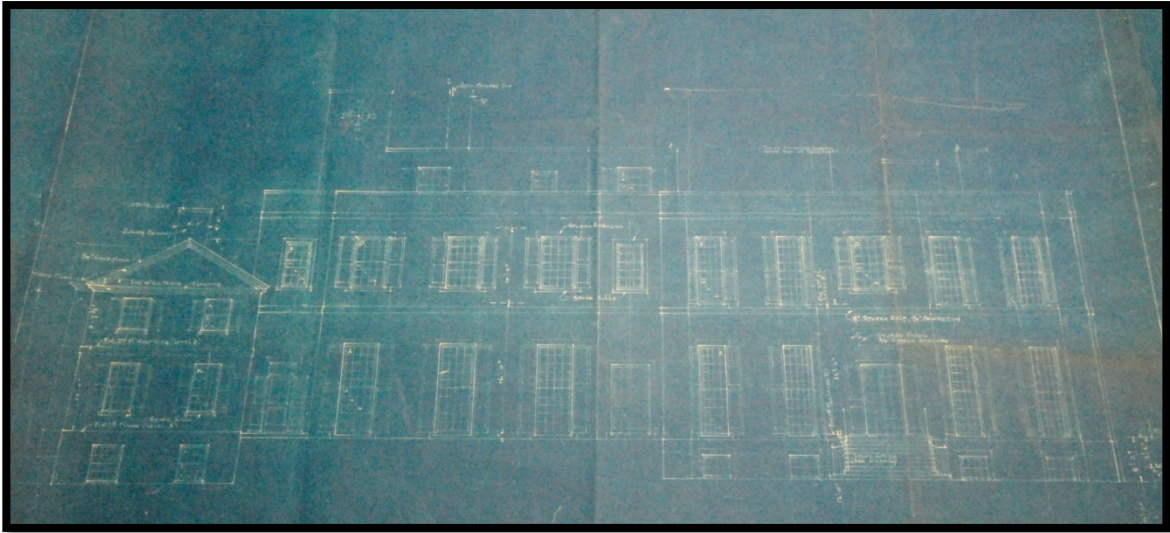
Final West Elevation of Cottage drawn by Leslie Potts (from Winterthur Archive).
